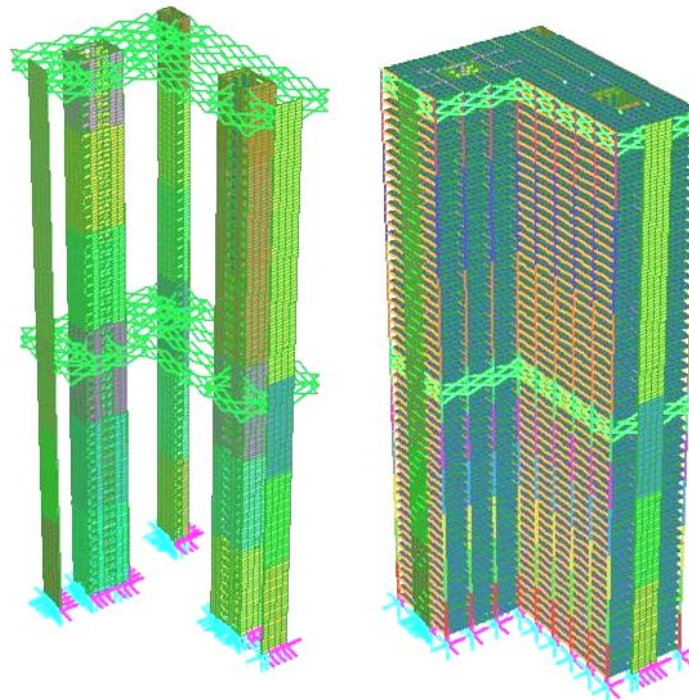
L-Shaped Model Elevation (Shear Wall and Full Model)
